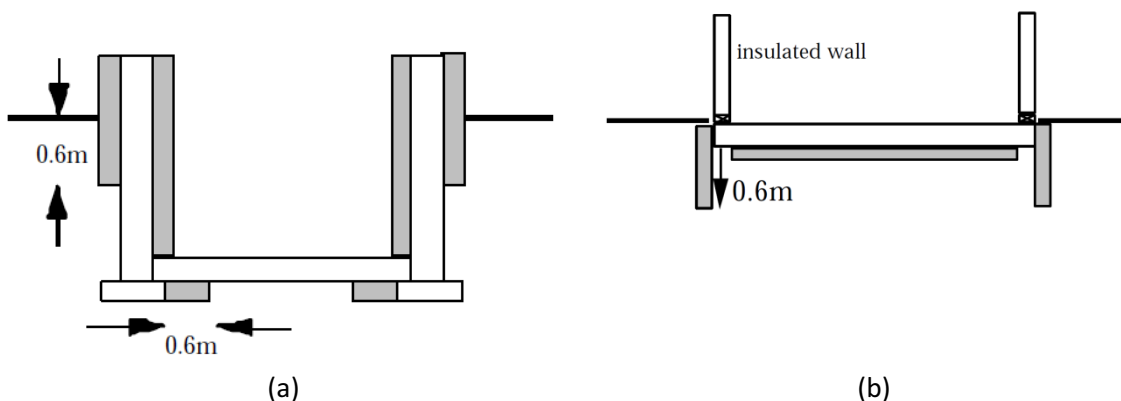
Example BASESIMP foundation descriptions for (a) basement with full wall interior, partial wall exterior, and bottom slab perimeter insulation, and (b) slab on grade full bottom slab and skirt insulation (NRCan 1999)
